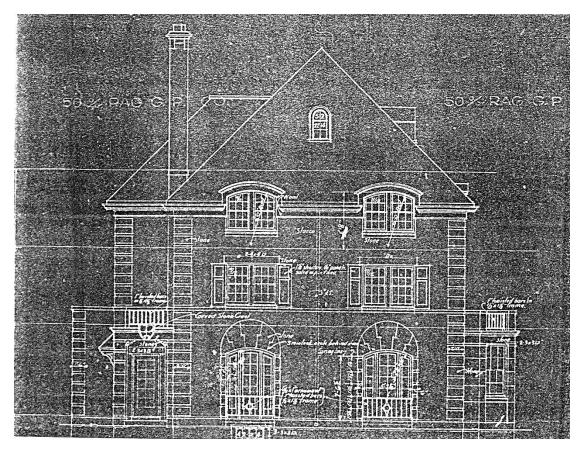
North Elevation as drawn by Miller and Craig in 1929
